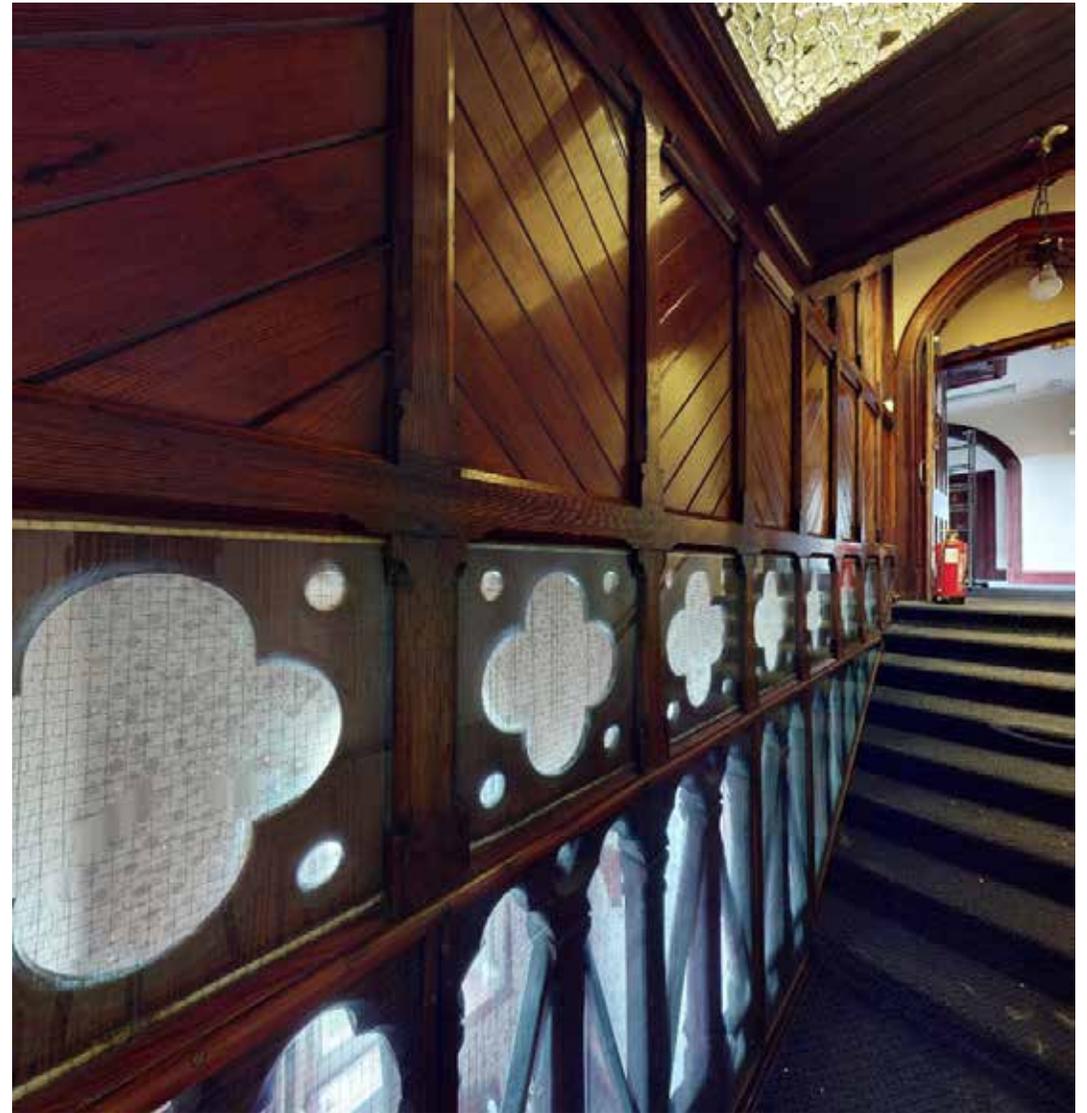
Photo of an existing partition to be retained. Image to support heritage matrix proposed works 10.
